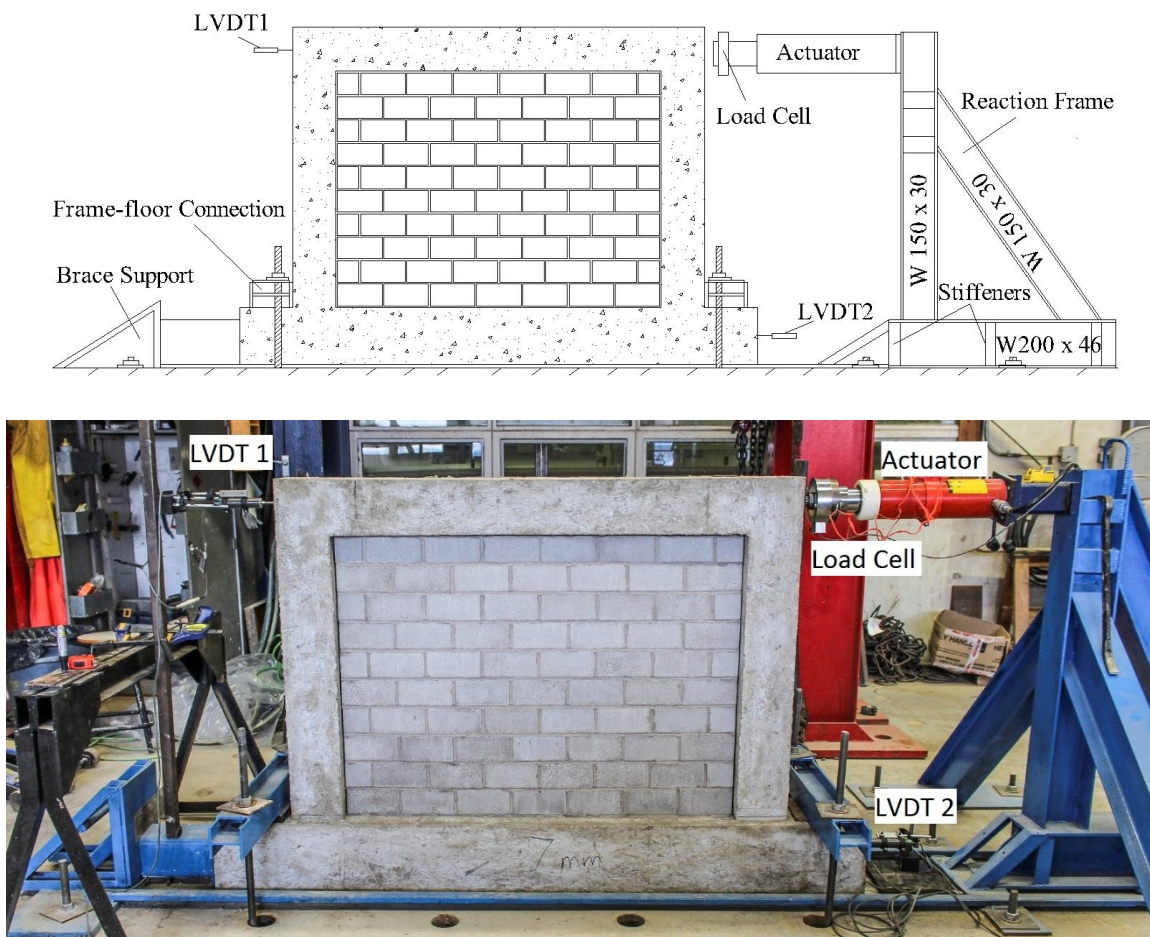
Test setup details, main LVDT locations and side view of the test setup
